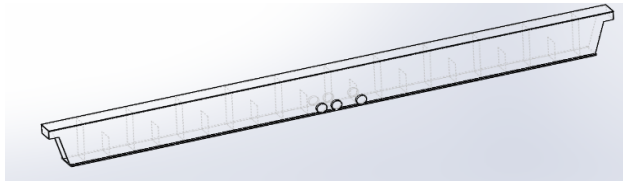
Isometric view (SolidWorks extract) of the bridge girder
